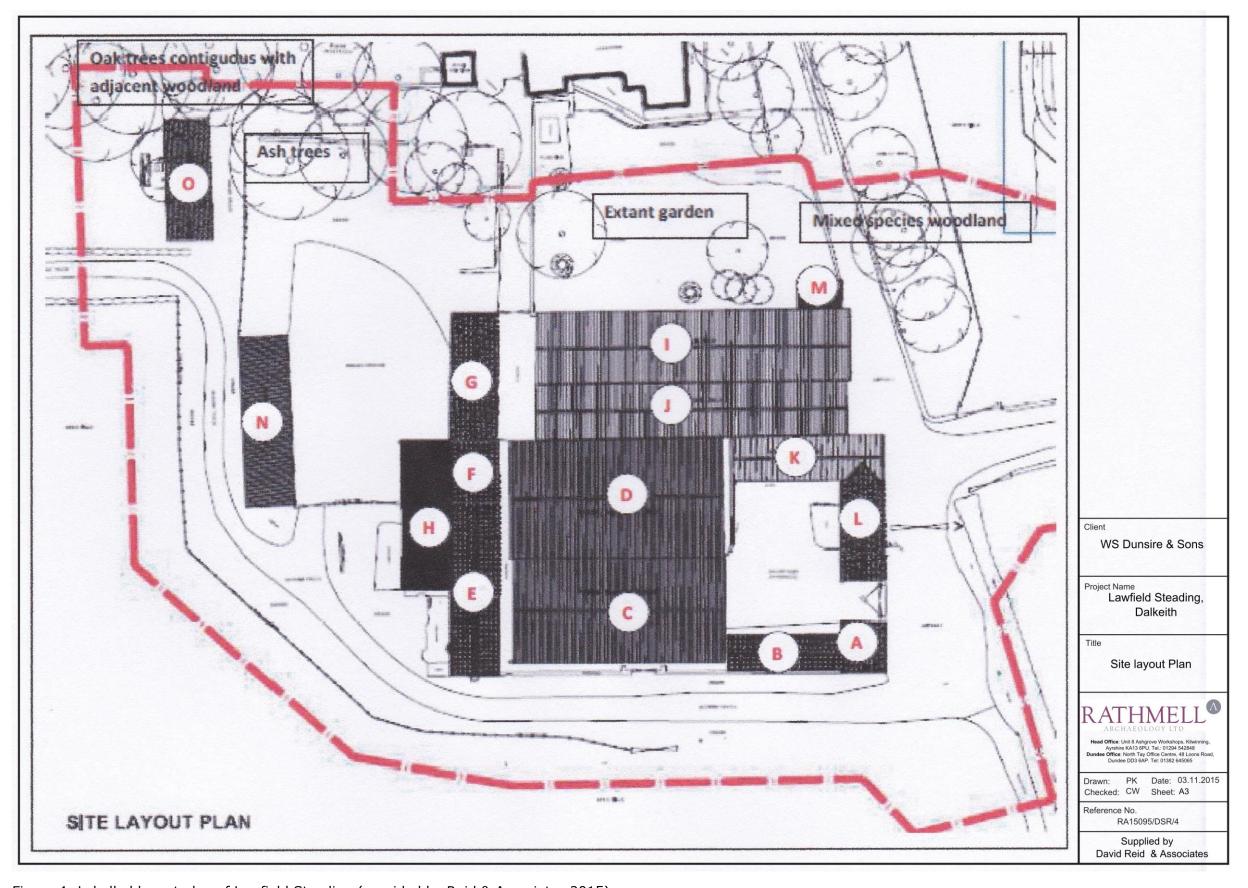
Labelled layout plan of Lawfield Steading (provided by Reid & Associates 2015)
